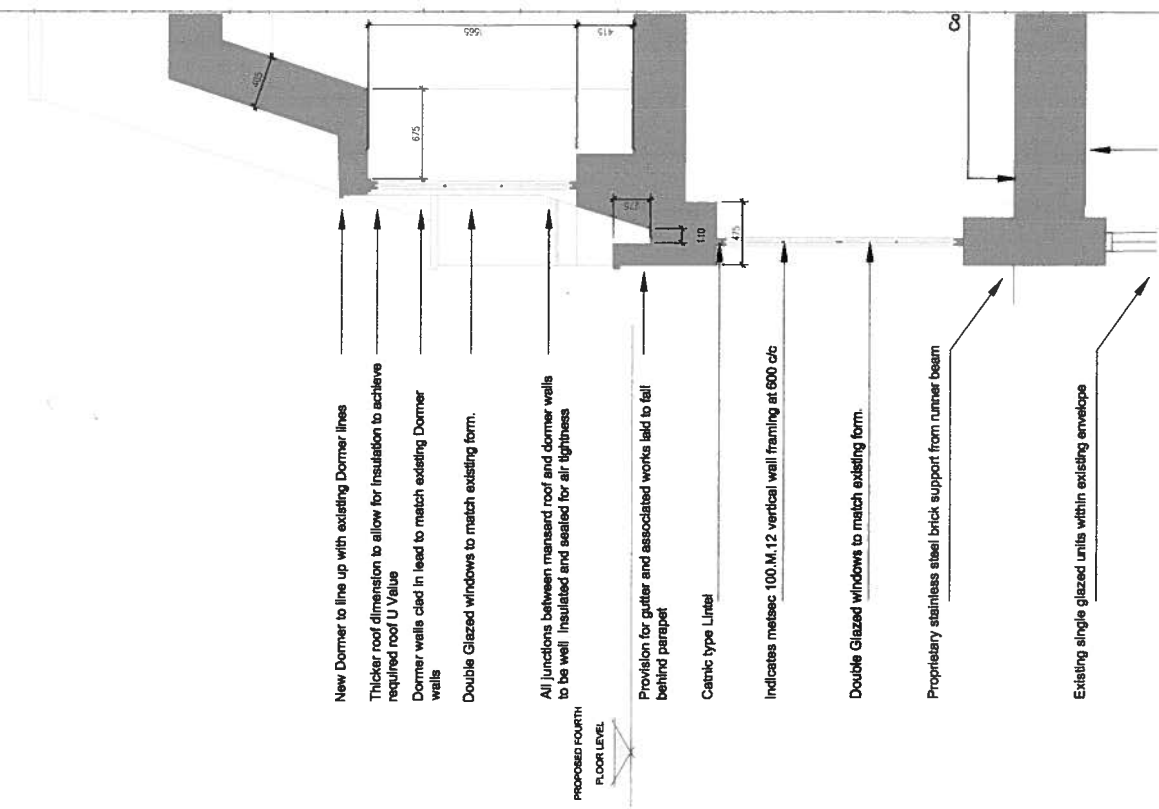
Detail of the additional floor & Mansard to the North Block
